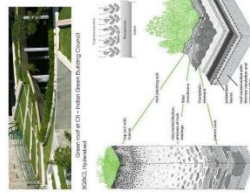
A green roof structure showing layers: vegetation, substrate, drainage, insulation, and structural deck.
